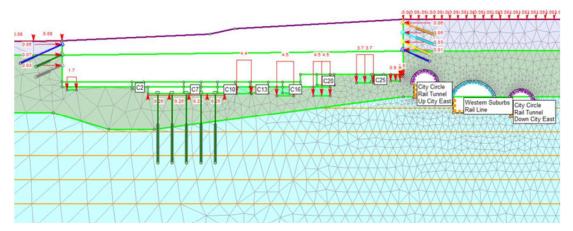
Geotechnical model for the section adjacent to Age Tunnels (Macquarie Street)
